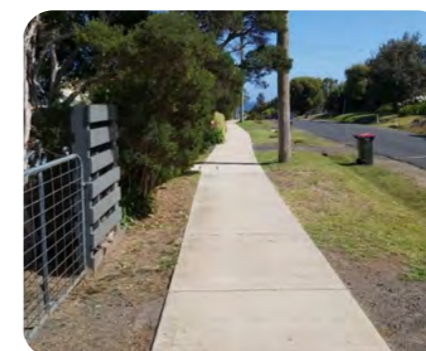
Reinforced concrete footpath along Smiths Beach Road
